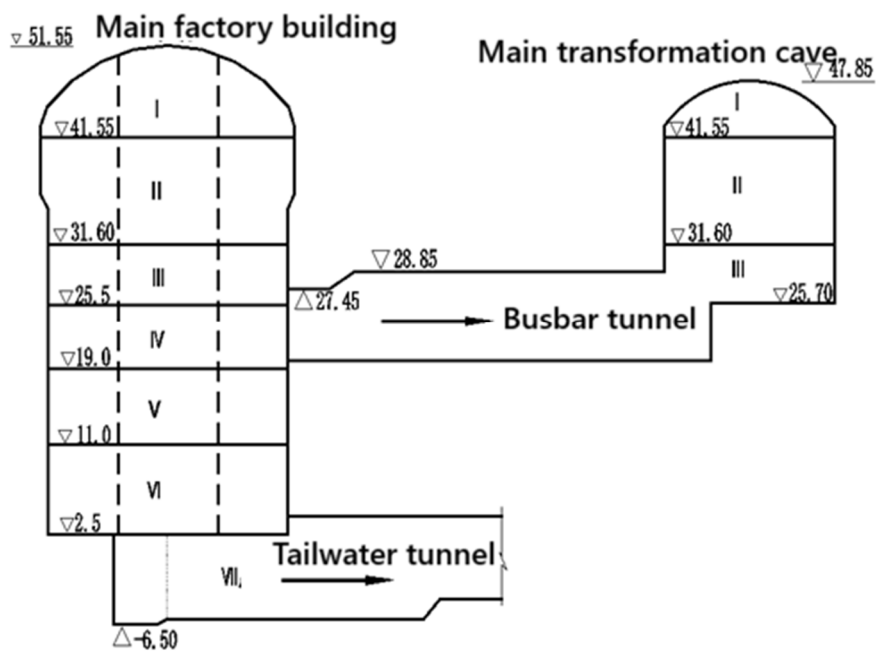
Schematic diagram of layered excavation of underground powerhouse
